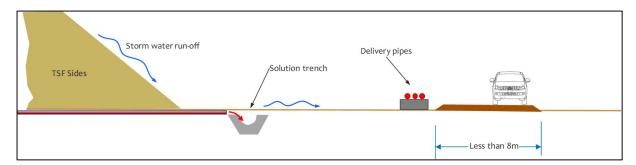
REVISED TSF PERIMITER LAYOUT
